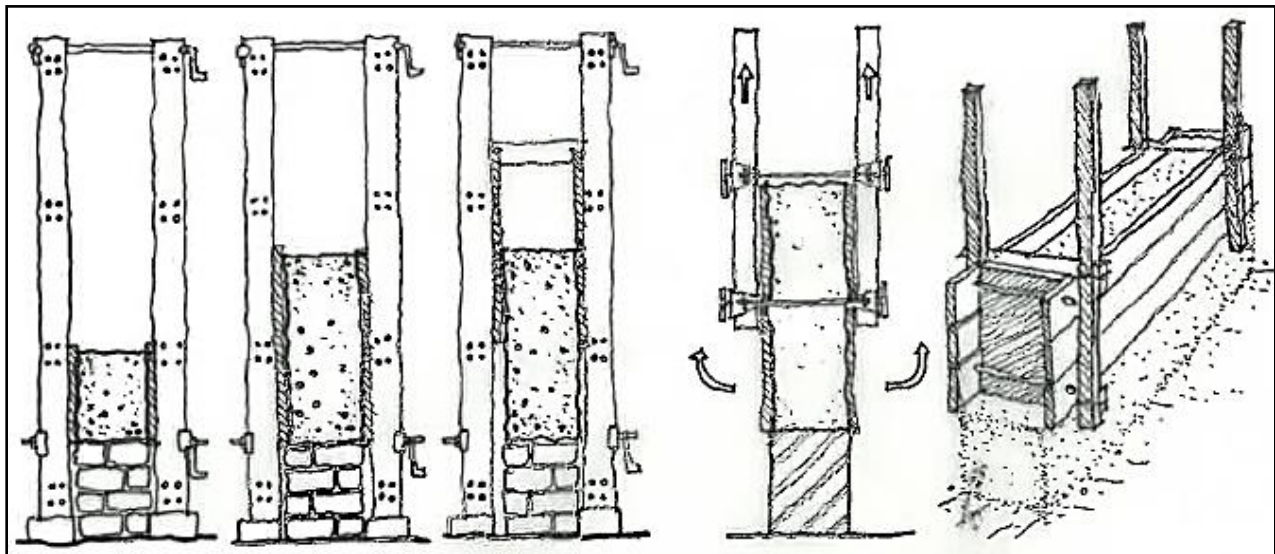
illustrate techniques (in section and 3-dimensional view sketches) to construct Rammed earth using parallel panels. *Source:* (Modified by Author from Minke, 2006).
